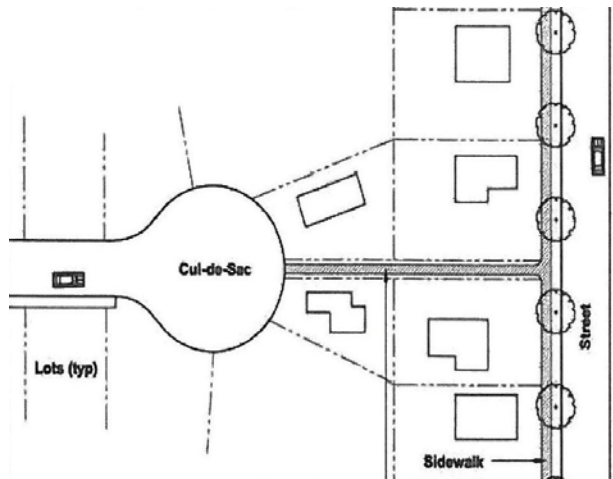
A: 10 ft. access easement from head of cul-de-sac to nearest street or path
